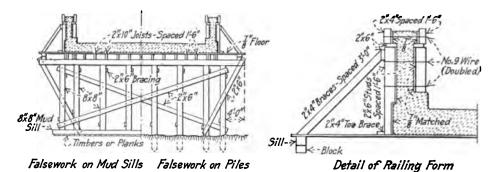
FALSEWORK PLANS AND RAILING FORMS FOR CONCRETE BRIDGES.
